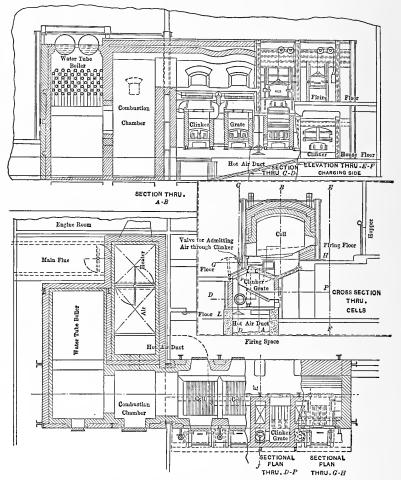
Plan and Sections, West New Brighton Incinerator.
